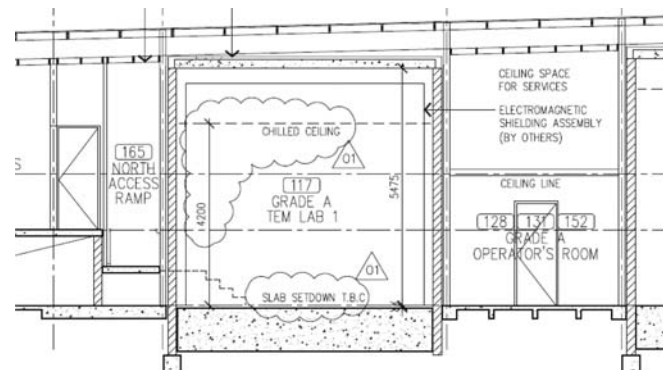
Cross section through an A Class Lab showing isolation between floor slabs, masonry walls and the inner laboratory floor slab.
